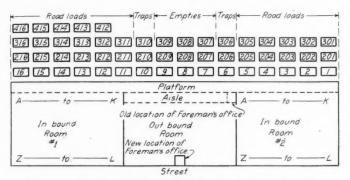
Plan of Cleveland Freight House and Car Arrangement.
